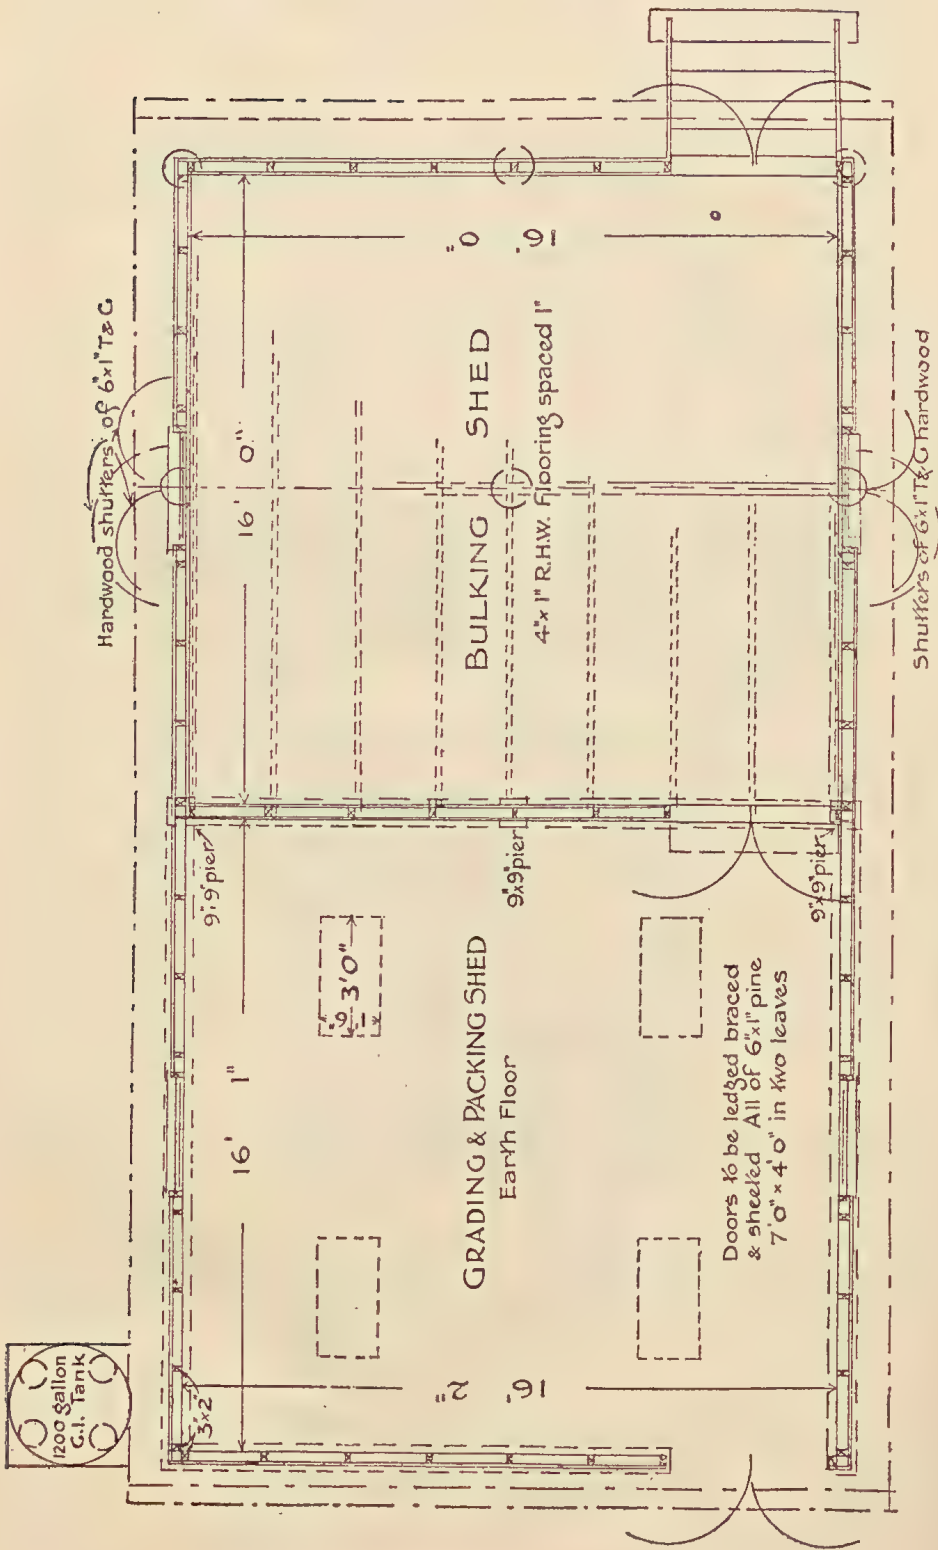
BULKING AND GRADING SHED (GROUND PLAN).
